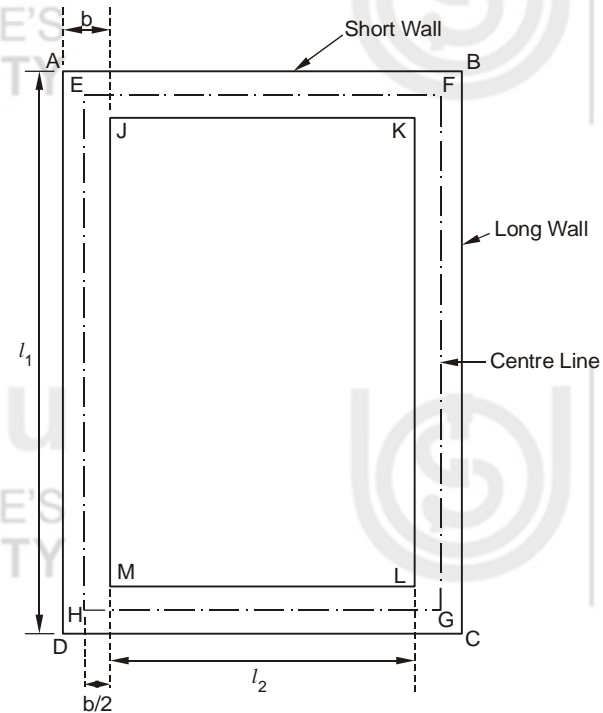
Centre-line, Long and Short Wall, Method of Computing Earthwork
